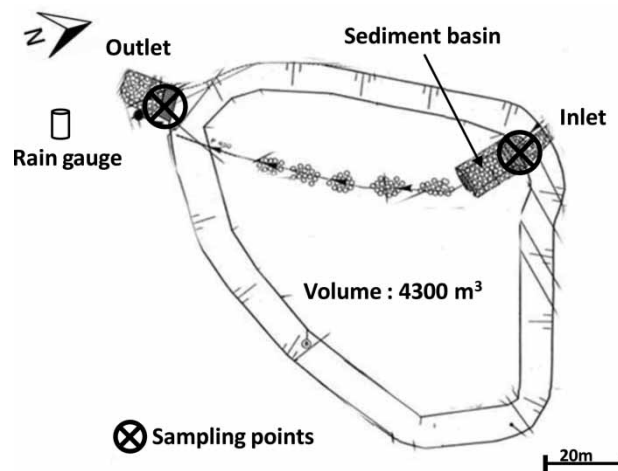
| Stormwater detention pond plan (GENIVAR 2005) and location of rain gauge and sampling points.
